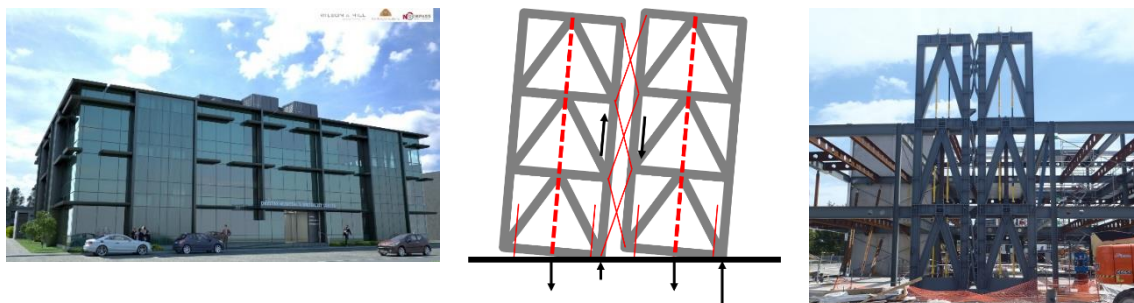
Forté Health Medical Centre, three storey building with over 5000m² of specialist medical facilities. Post-tensioned steel rocking coupled 'walls' (or braced-frames) in both directions, combining hysteretic and viscous dampers in parallel for "an advanced flag-shape" system (World first).
